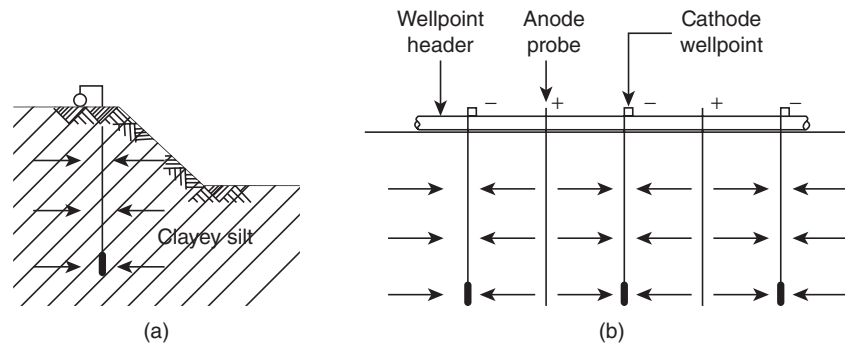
Electro-osmosis: (a) Cross section and (b) longitudinal section. (UFC-3-220-5)
